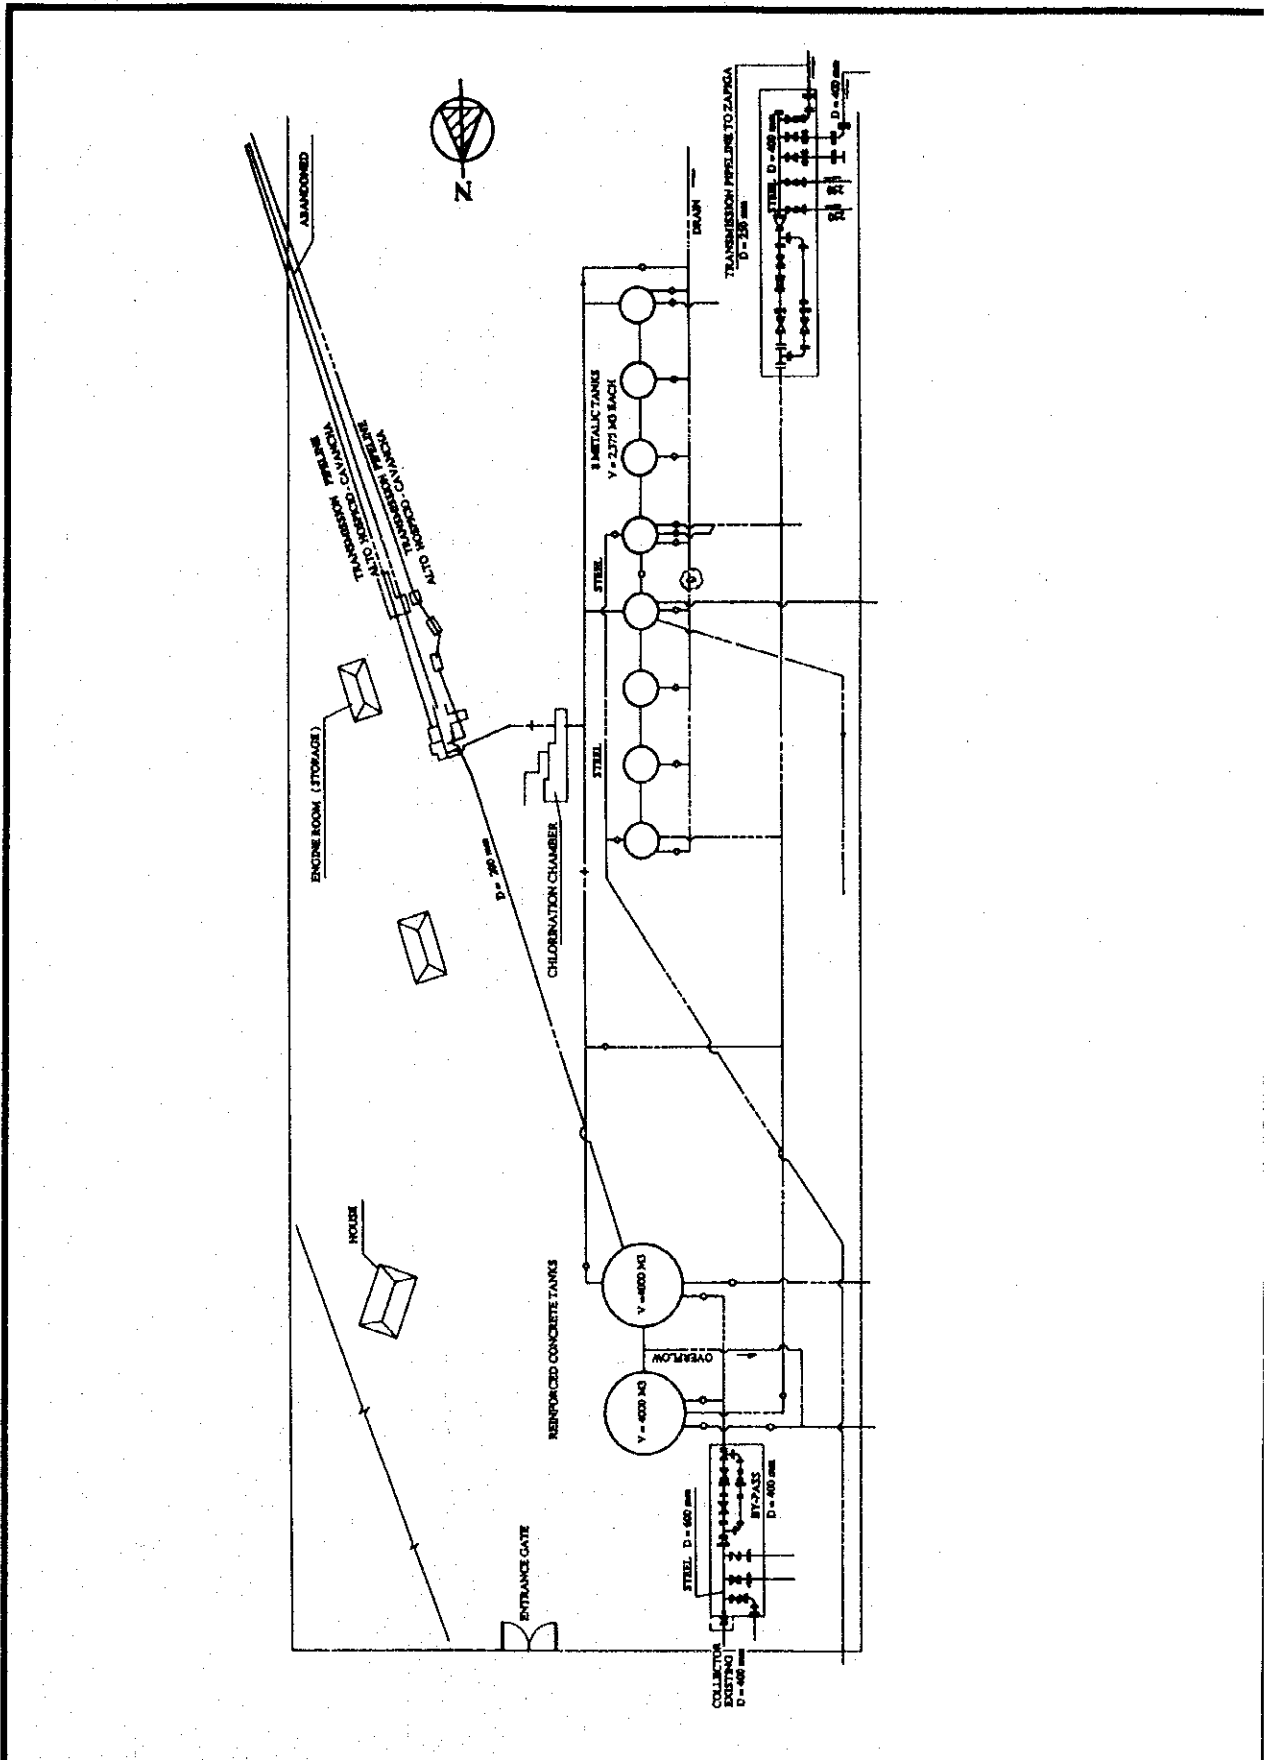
Cavancha Station Layout - Iquique
